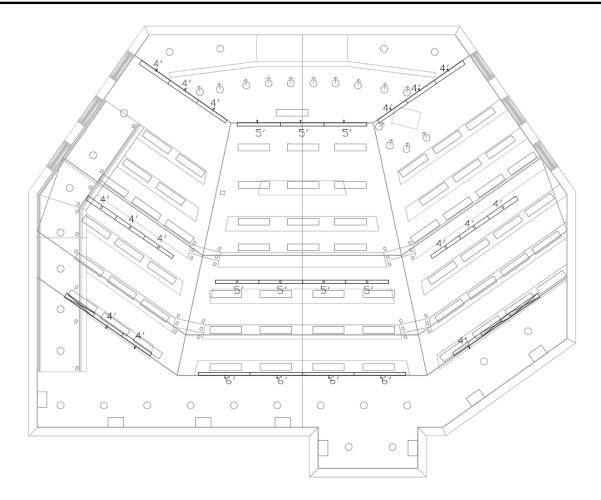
Lecture Hall Reflected Ceiling Plan – Diffusers and Lighting
